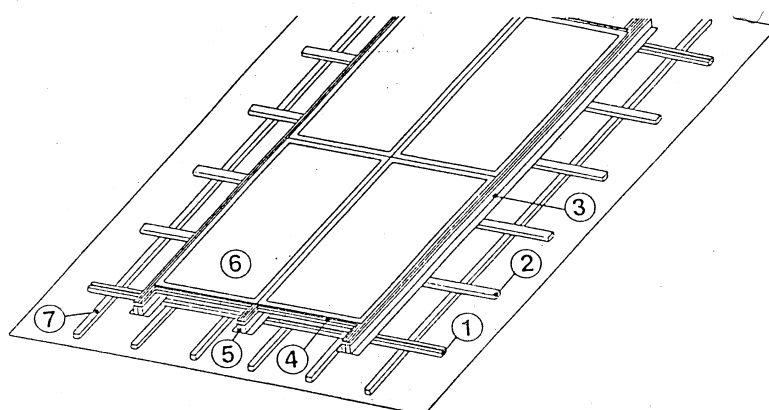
Old example for a construction for the integrated mounting on a slanted roof Legend: 1. C-Profile (steel) 2. tiles slats (Wood) 3. side profile (aluminium) 4. cross section (aluminium) 5. Longitudinal profile (aluminium) 6. PV-Laminate. Source: <Prinz et al. 1992>
